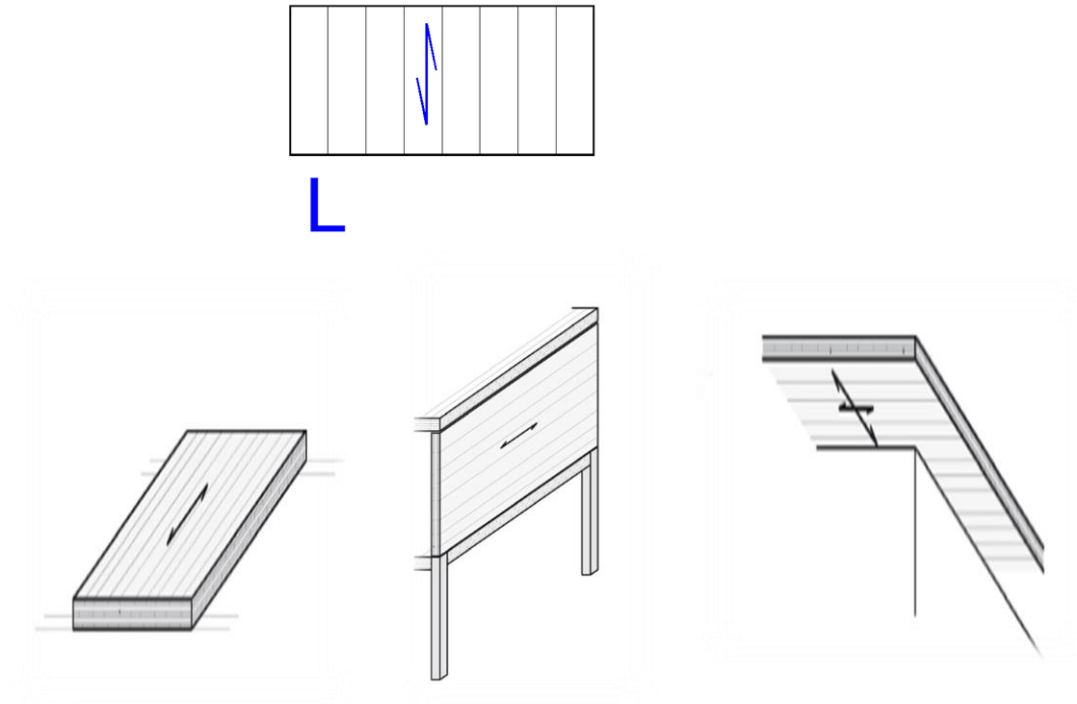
L or DL elements, the top layer longitudinal to the long element side (above). Ceiling, grinder, and roof are respectively examples for L or DL designation (down)[12]
